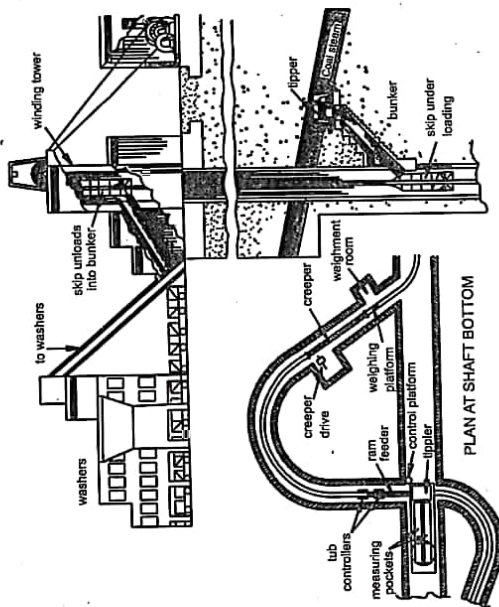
General arrangement at the pit top and pit bottom loading point
